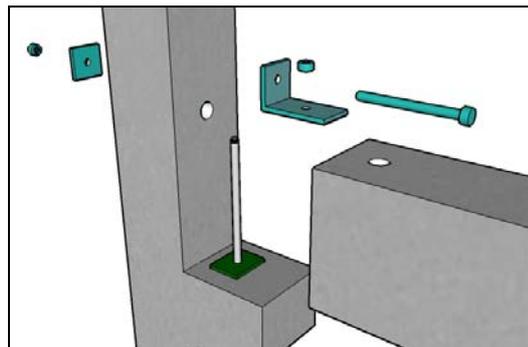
Proposed hybrid beam-to-column connection in precast concrete frame.
